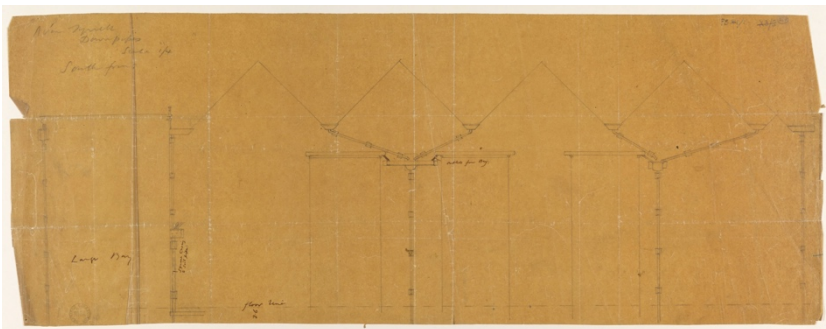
Avon Tyrell, Hampshire, W.R.Lethaby's study drawing for drainage to the garden elevation. RIBA Drawings Collection, Victoria and Albert Museum
